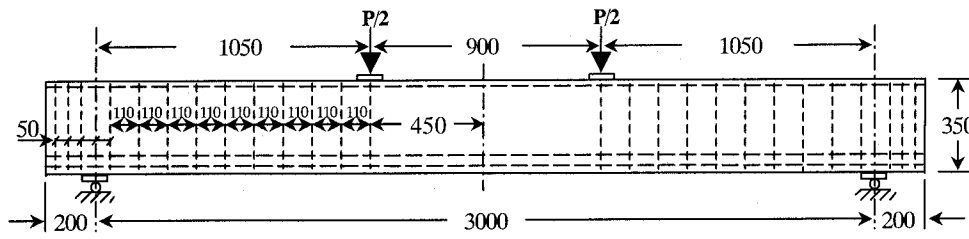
Loading pattern and stirrup arrangement (unit : mm)
